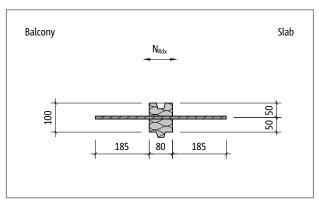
Schöck Isokorb® T type H-NN1: Product layout
